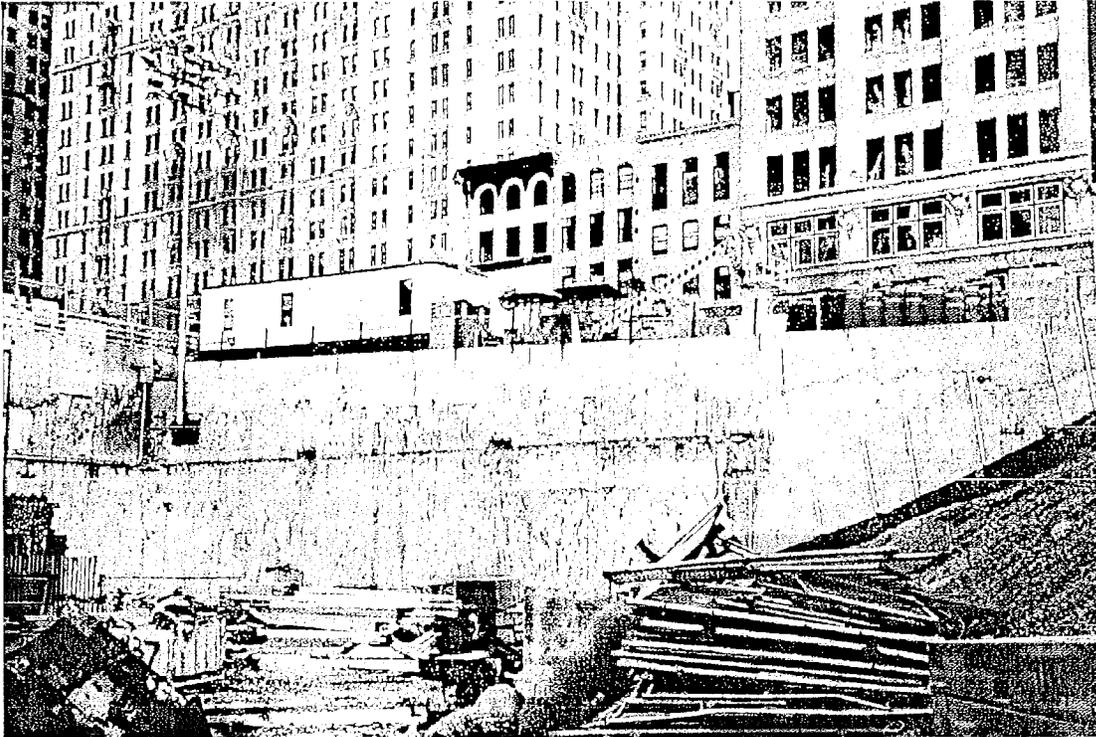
Former H & M Terminal train tubes, later converted to truck ramps, looking east. Church Street in background.
